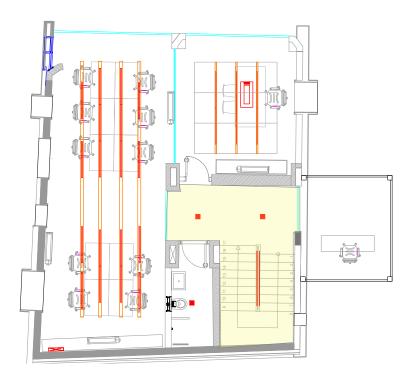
ERKE's Lighting Circulation Areas Layout in the First Floor
